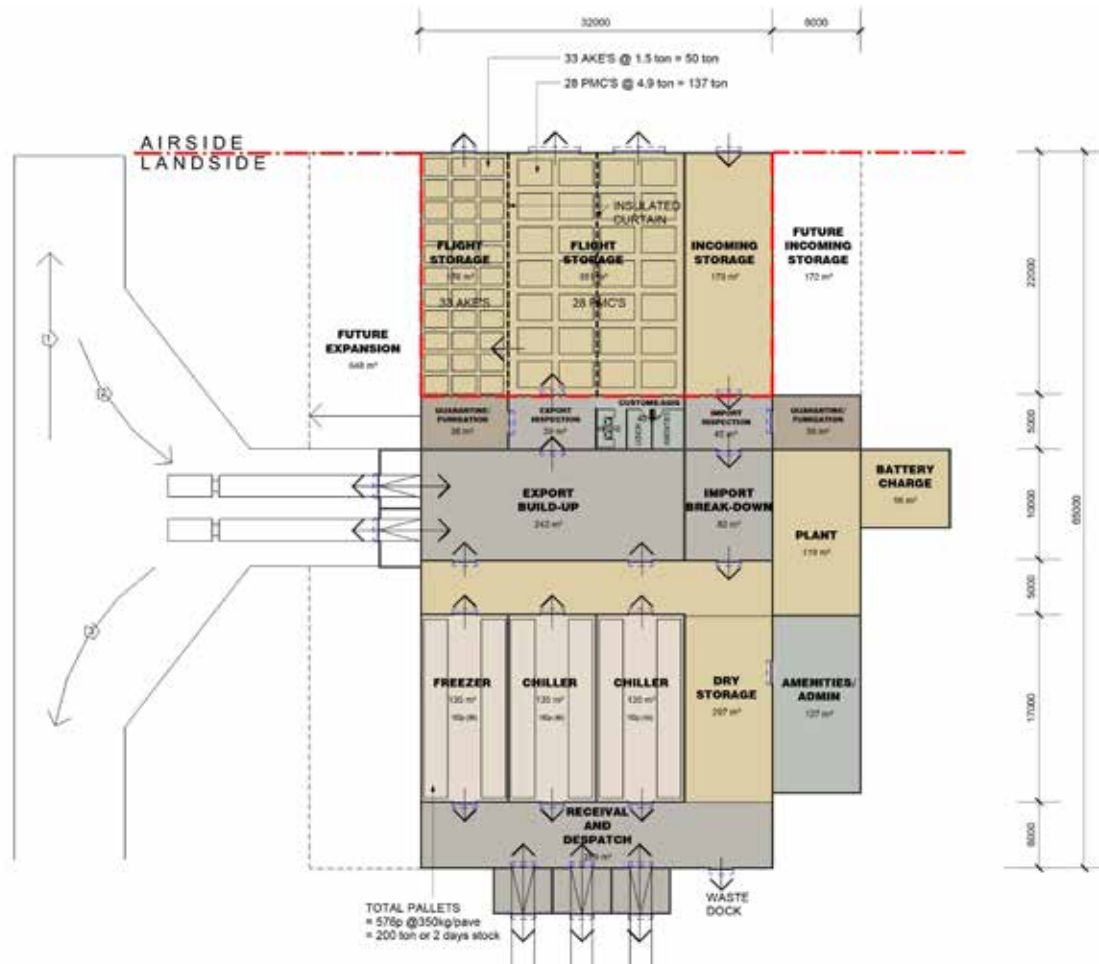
Concept Plan 1 – CTO Facility (SKO 1-3)
